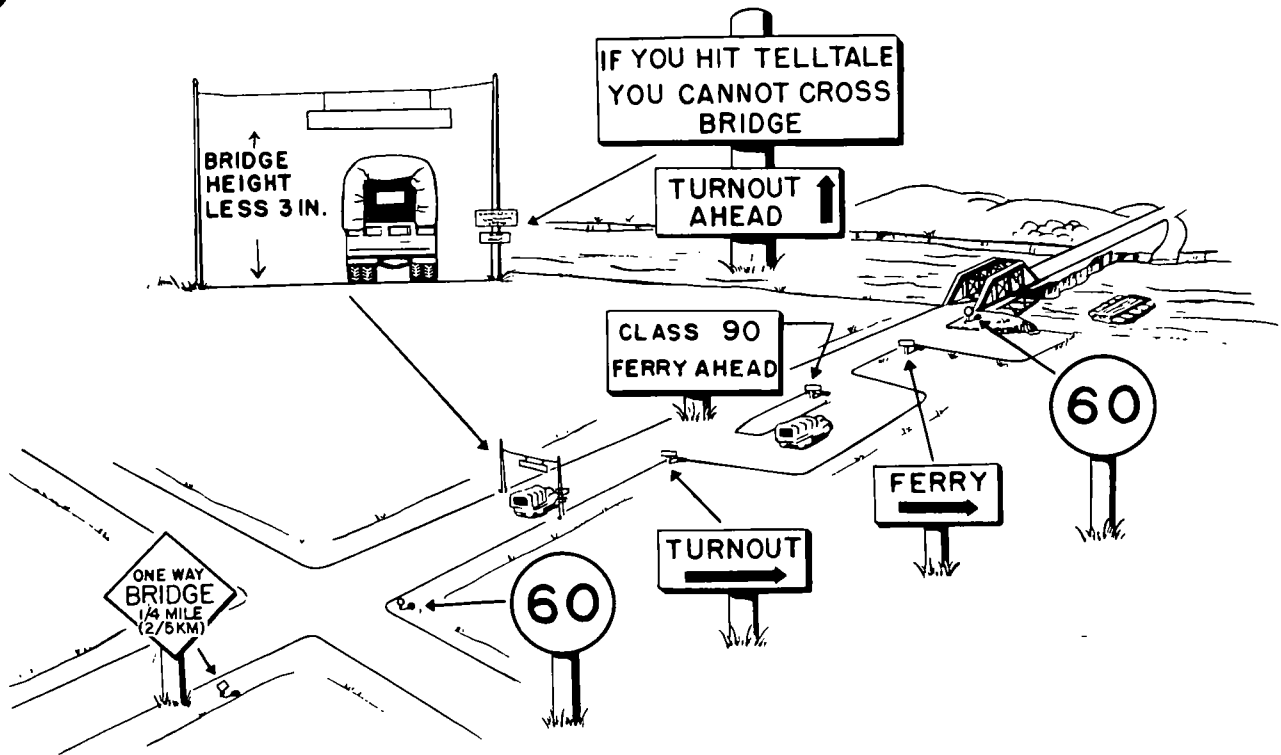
Typical arrangement of road-guide, information, and single-lane bridge-class signs.
